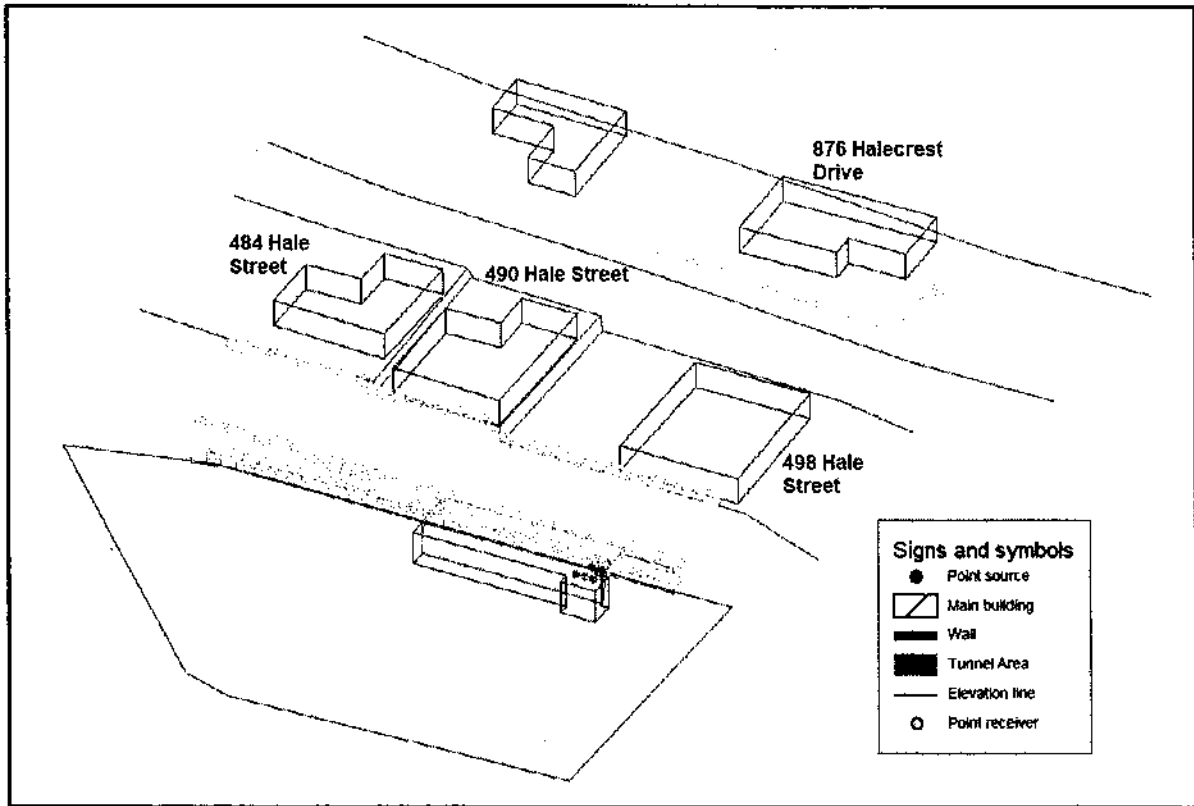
3D Wireframe of Modeled Project Site Plan with All Source and Receiver Locations
